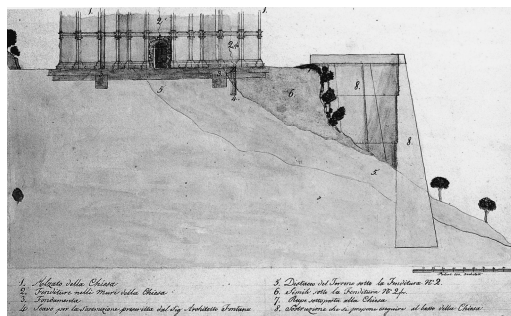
Southern gravity wall project (Luigi Poletti 1836).
